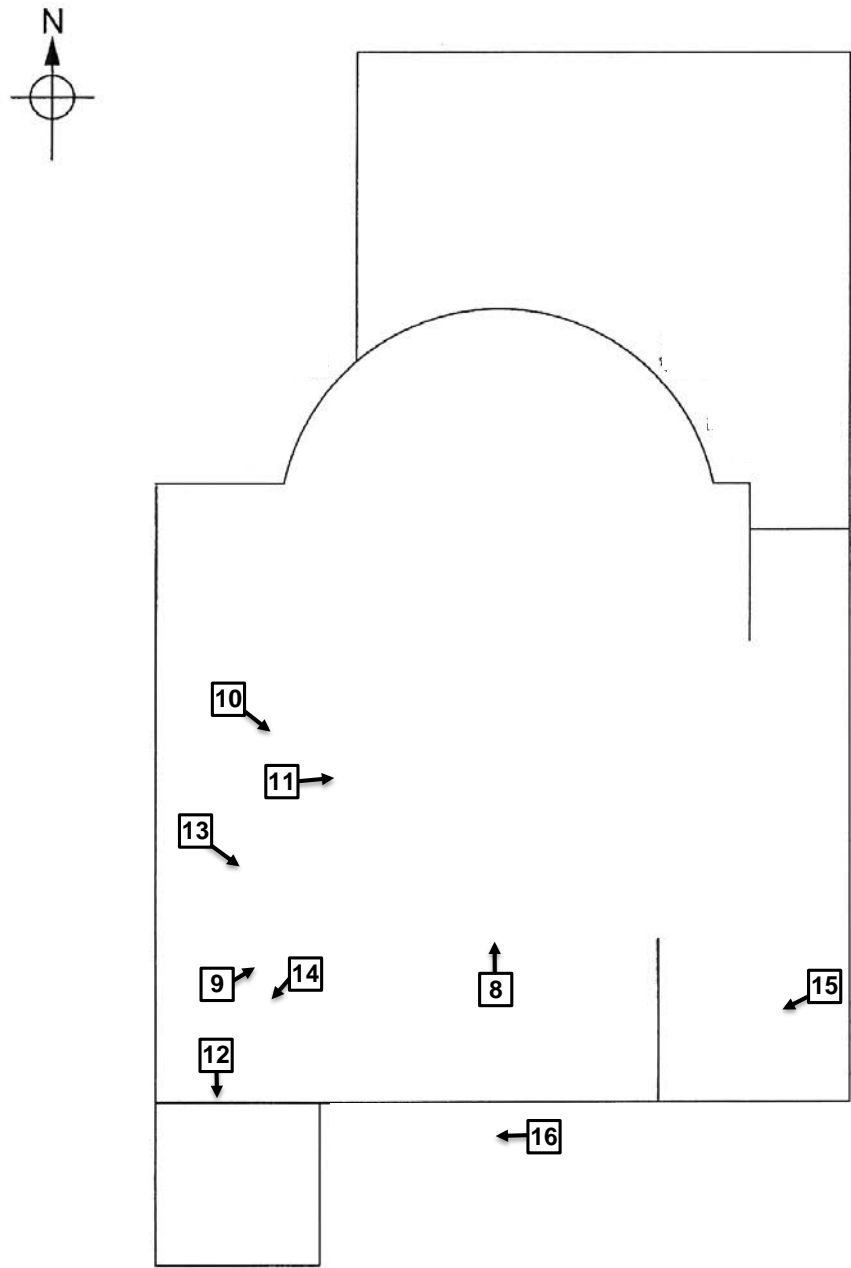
Main Floor Plan and Photo Key 2 (Photos 8-16)
